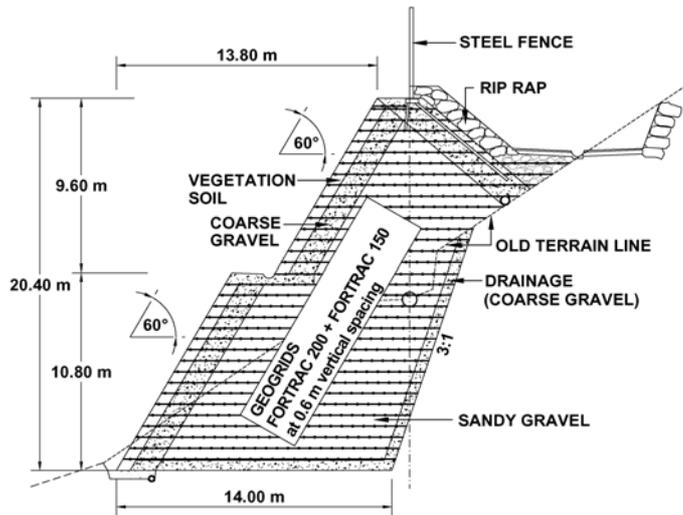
Gondo: typical cross-section of the stone avalanche and rock-fall protective wall
